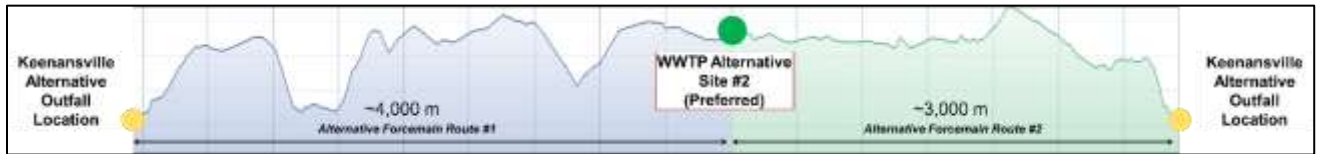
Alternative Forcemain Routes from the Preferred WWTP Site to the Outfall
